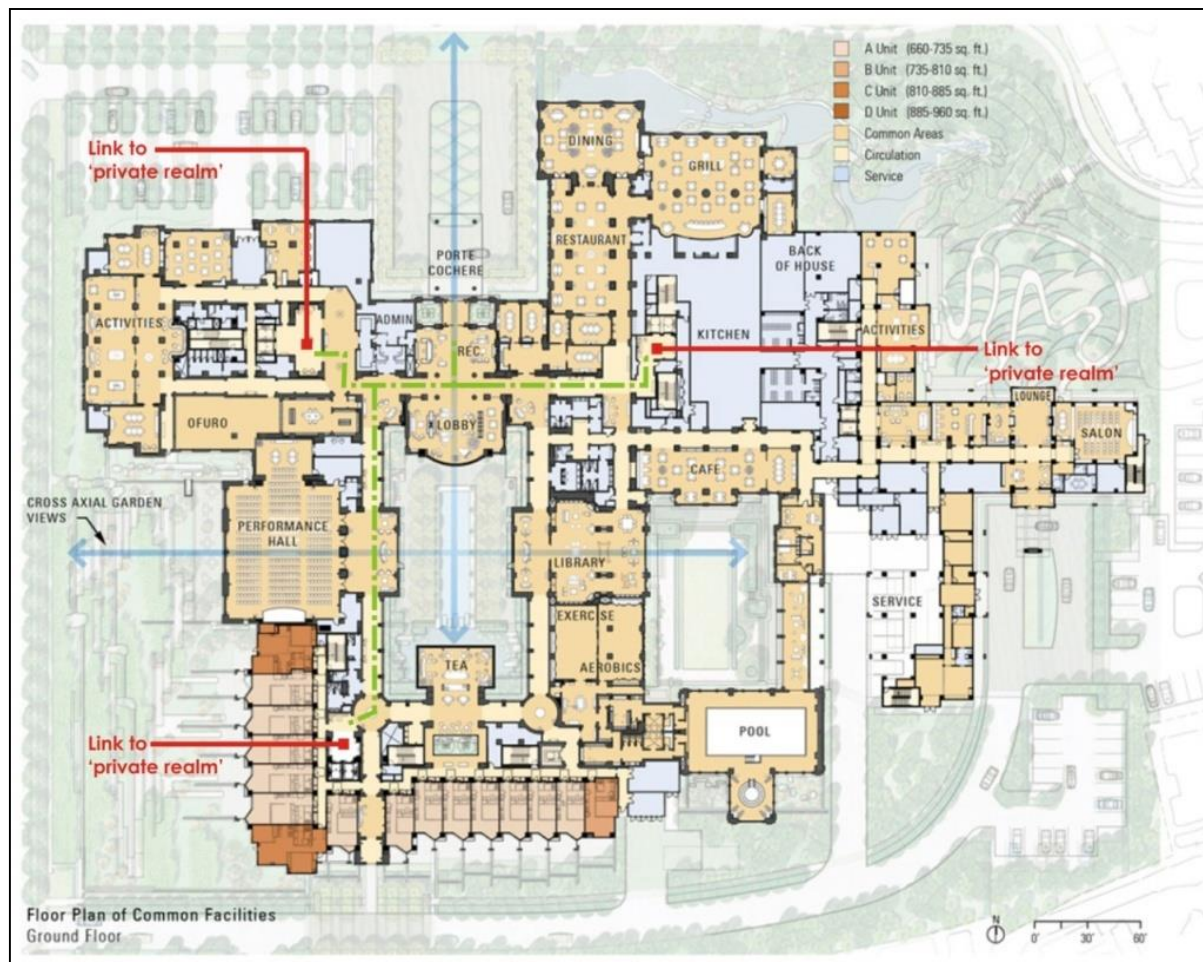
Ground Floor Plan of common facilities and one of the residential zones located on the ground floor (adapted from - www.bararch.com).
